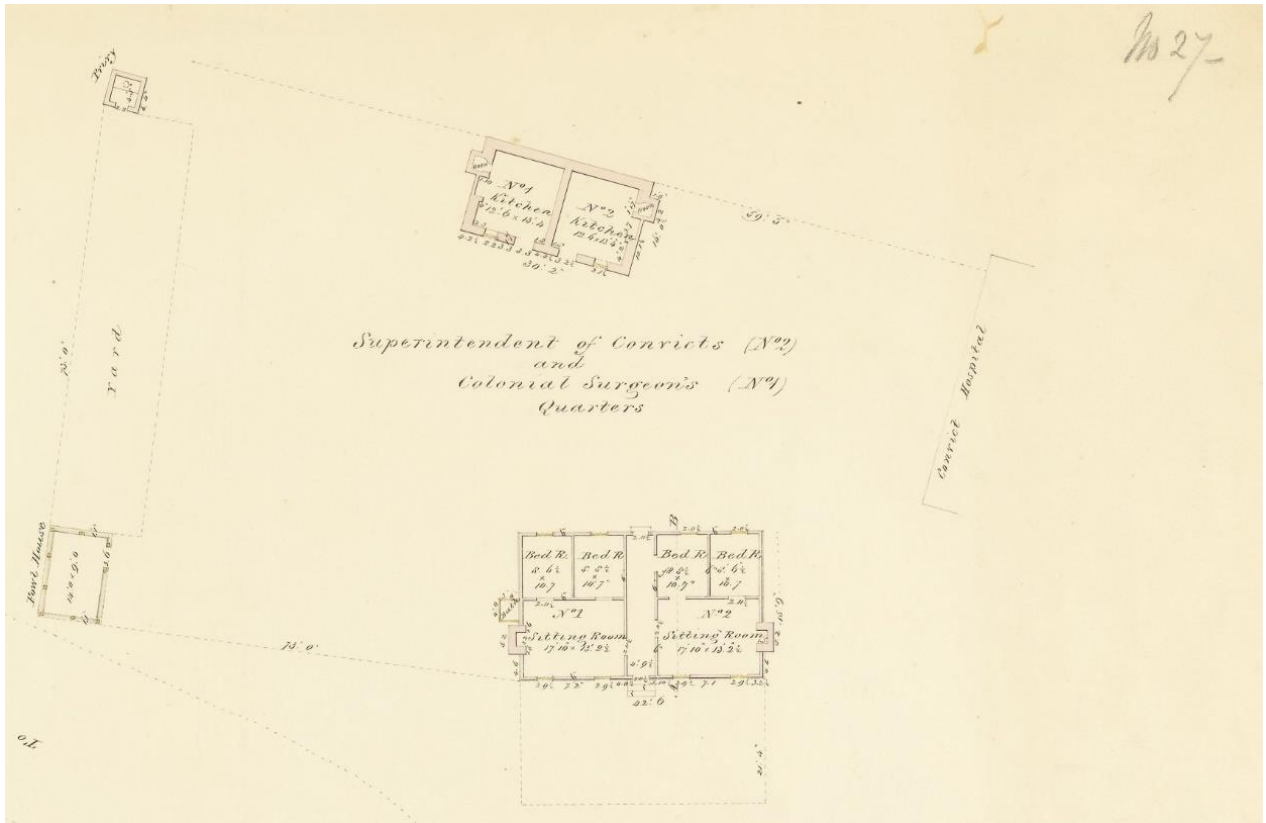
Detail of "Plans Sections and Elevations of Colonial Surgeons Quarters", 1839. (Source: Tasmanian Archives PWD266-1-1918).
